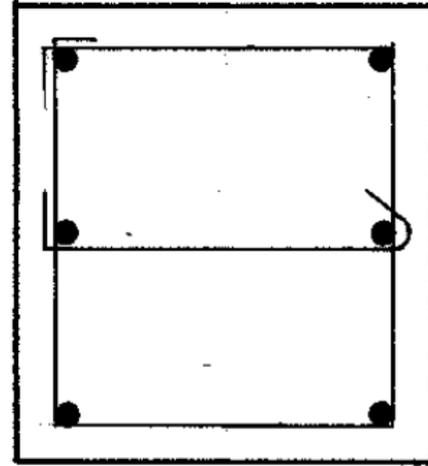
Typical section of column calculated. Column is located at F10 on the 5th floor.
